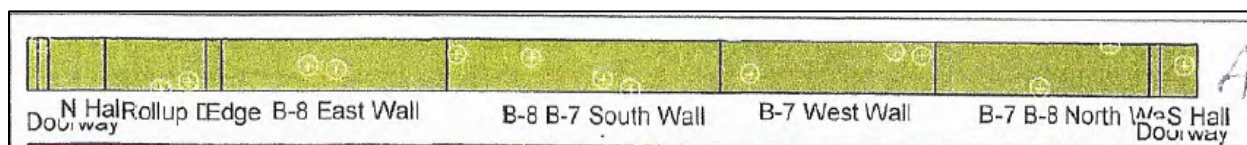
Room B-7 Original Wall Survey Measurement Locations
